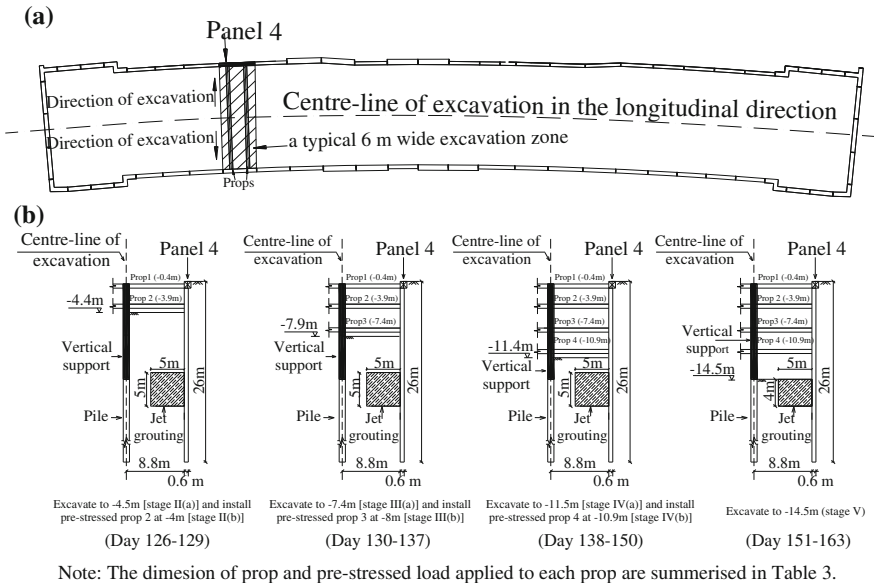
a Plan view of excavation zone and props at Panel 4; b Cross section view showing cycles of excavation and propping at Panel 4 (section A-A', Fig. 3.1)
